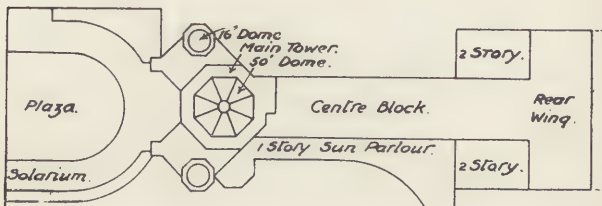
Block Plan, Marlborough-Blenheim Hotel.
